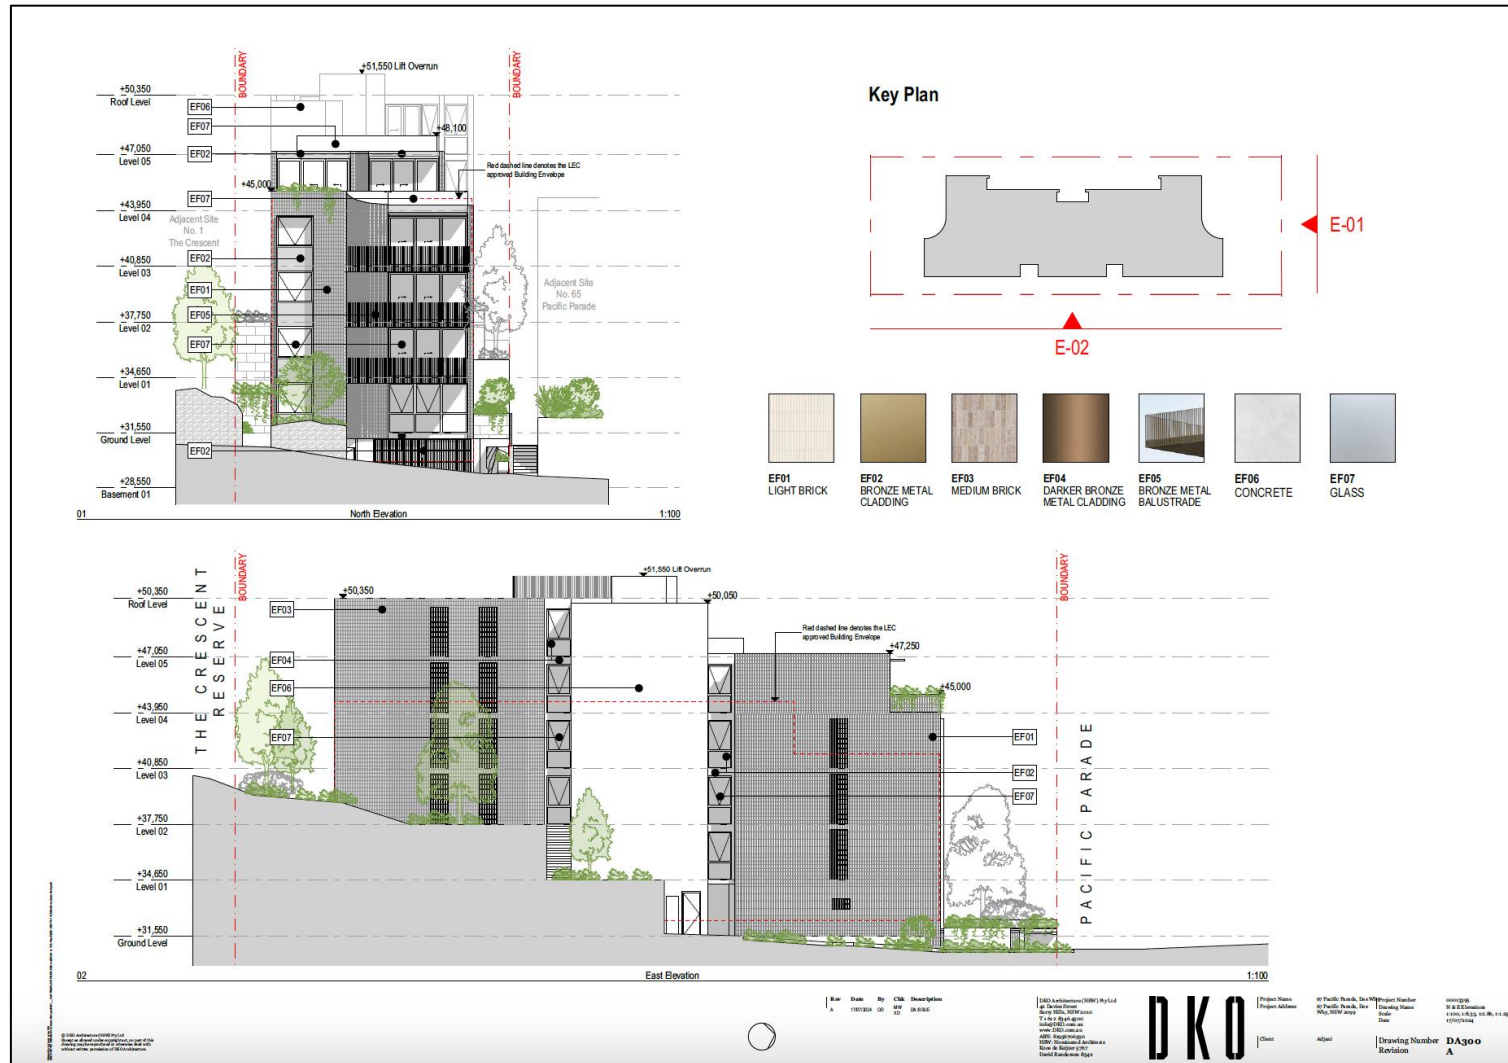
ILLUSTRATES PROPOSED NORTH & EAST ELEVATIONS
